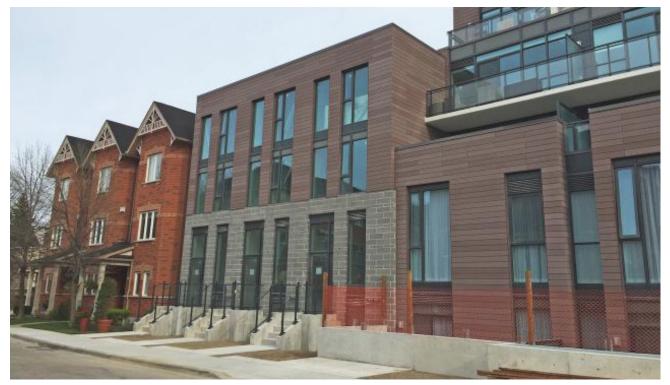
Warm cladding tons to echo the brown brick of the existing low-rise building.
